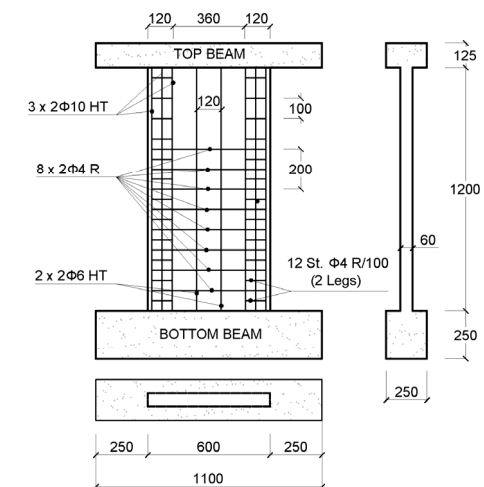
Geometry and reinforcement details of wall SW8 / Geometria e dettagli delle armature per il muro SW8.
